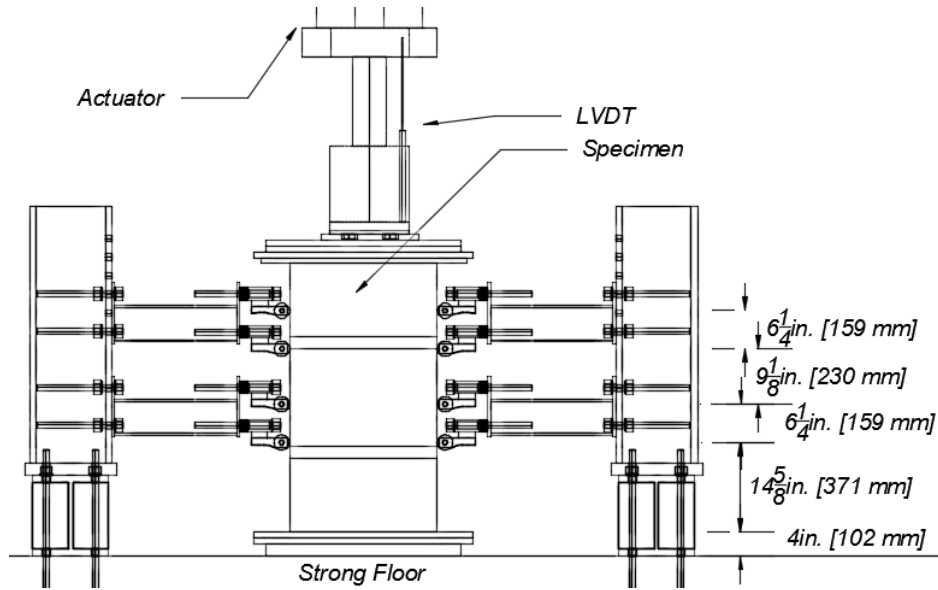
Front view elevation of test setup for the specimens containing #4 (#13M) reinforcing bars across the interface
